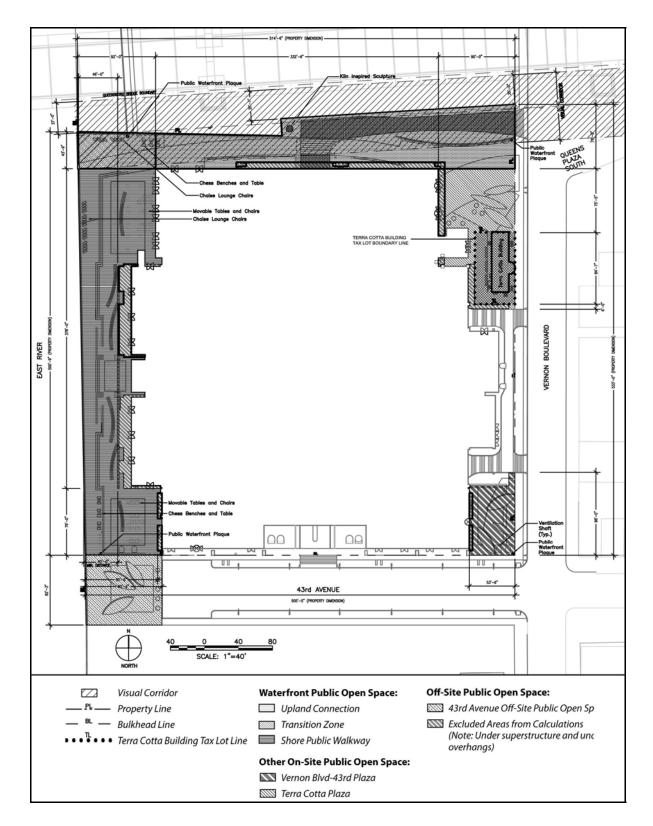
Landscaping and Open Space Plan The Project would provide a 500-foot long Esplanade along the entire waterfront of the Project Site. It would link the Upland Connection to the City-owned property at the foot of 43rd Avenue. The portion of the Esplanade at the end of the 43<sup>rd</sup> Avenue view corridor would provide public access to the East River, seating, and panoramic views of Manhattan. The northern end of the Esplanade would permit the future continuation of the public walkway to the City-owned property under the Queensboro Bridge and into Queensbridge Park. The Esplanade would provide two pedestrian circulation zones, an upper zone and a lower zone, that parallel the river's edge. The two distinct circulation zones would encourage a variety of passive recreational experiences along the waterfront: the upland path would be more shaded, adjacent to tables and chairs, and related to the building's ground floor and cultural uses, while the seaward path would be in a more exposed, sunny location, directed more to the north-south flow of pedestrians and to water-viewing.
